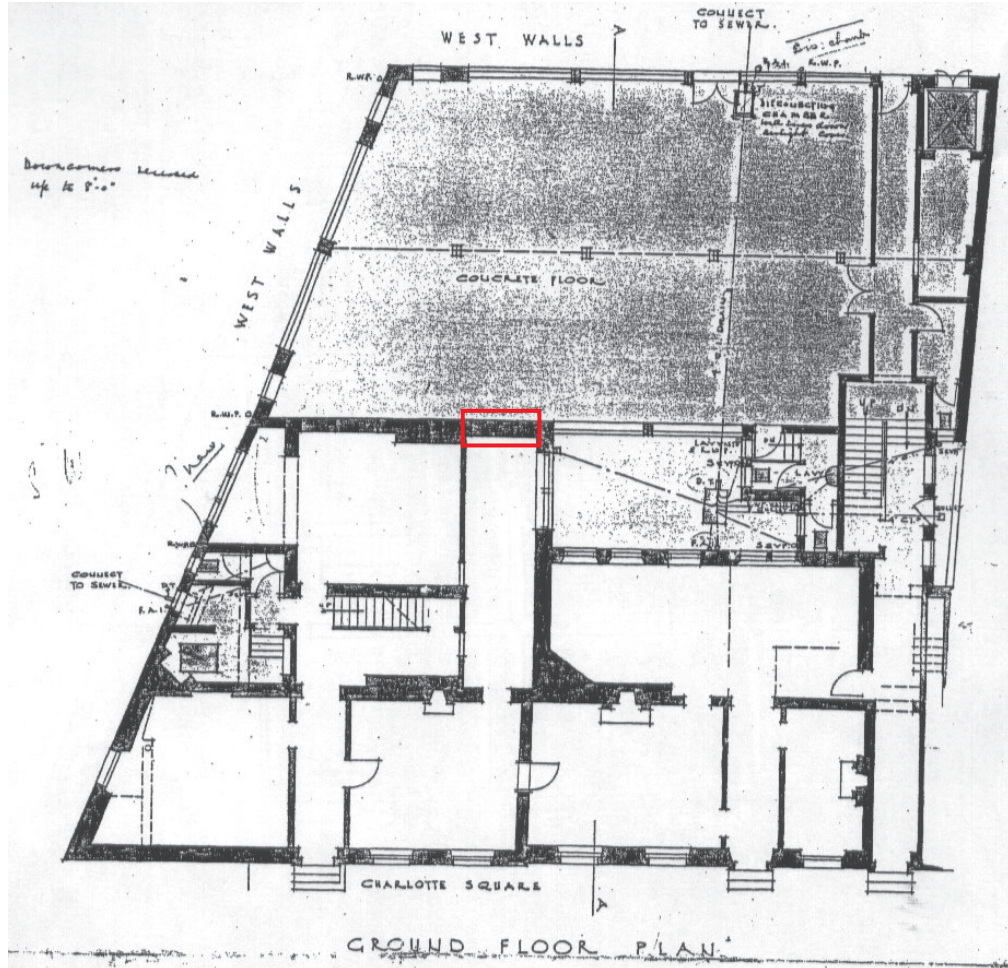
1929 plan of the buildings complex (Cacket & Burns Dick Architects, Drawing no. 1293/6), showing the location of the excavated stone foundation wall
